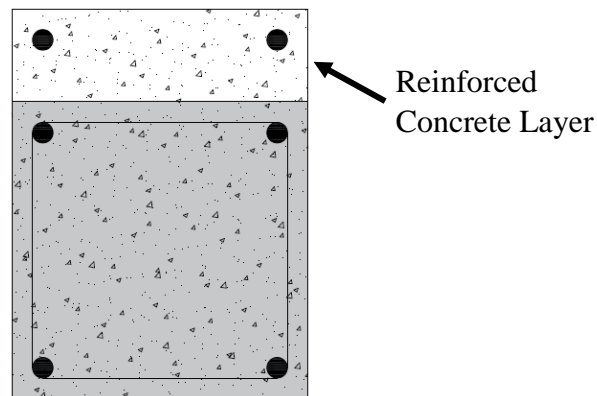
Profile of column with a reinforced concrete layer without shear connectors
